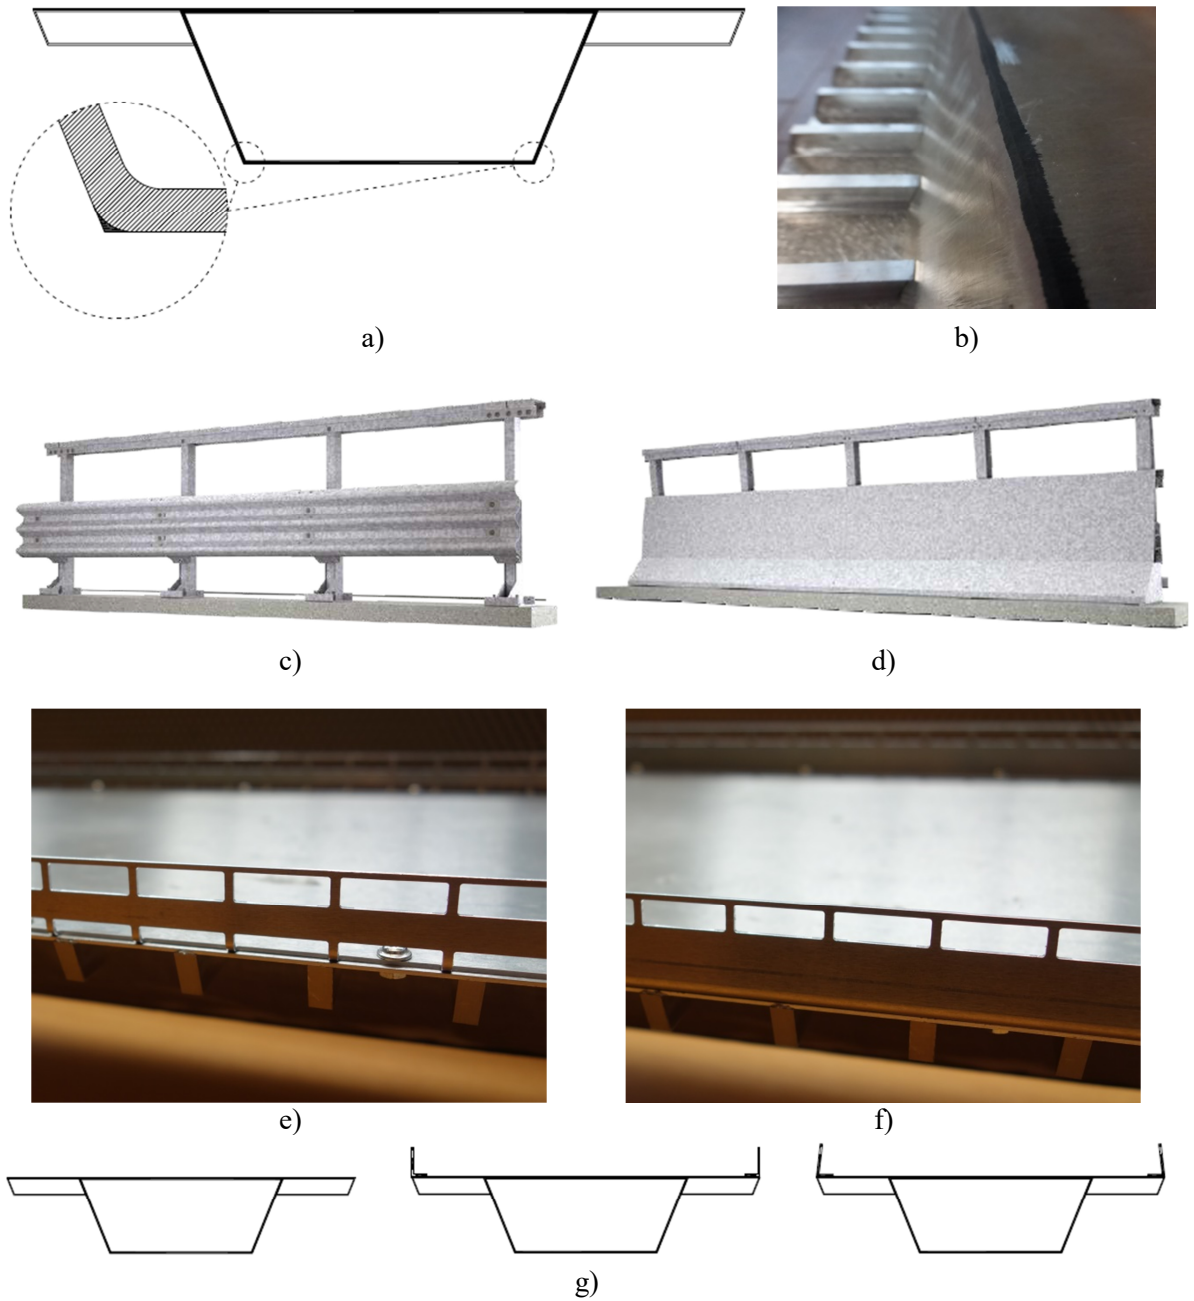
Overview of cross-section alteration through geometric details: modification of lower corners of the girder (a, b) and addition of Barrier 1 (c, e) and Barrier 2 (d, f) to the bridge deck sectional model. Comparison between section layouts (g) without barriers (left), with Barrier 1 (center) and with Barrier 2 (right)
